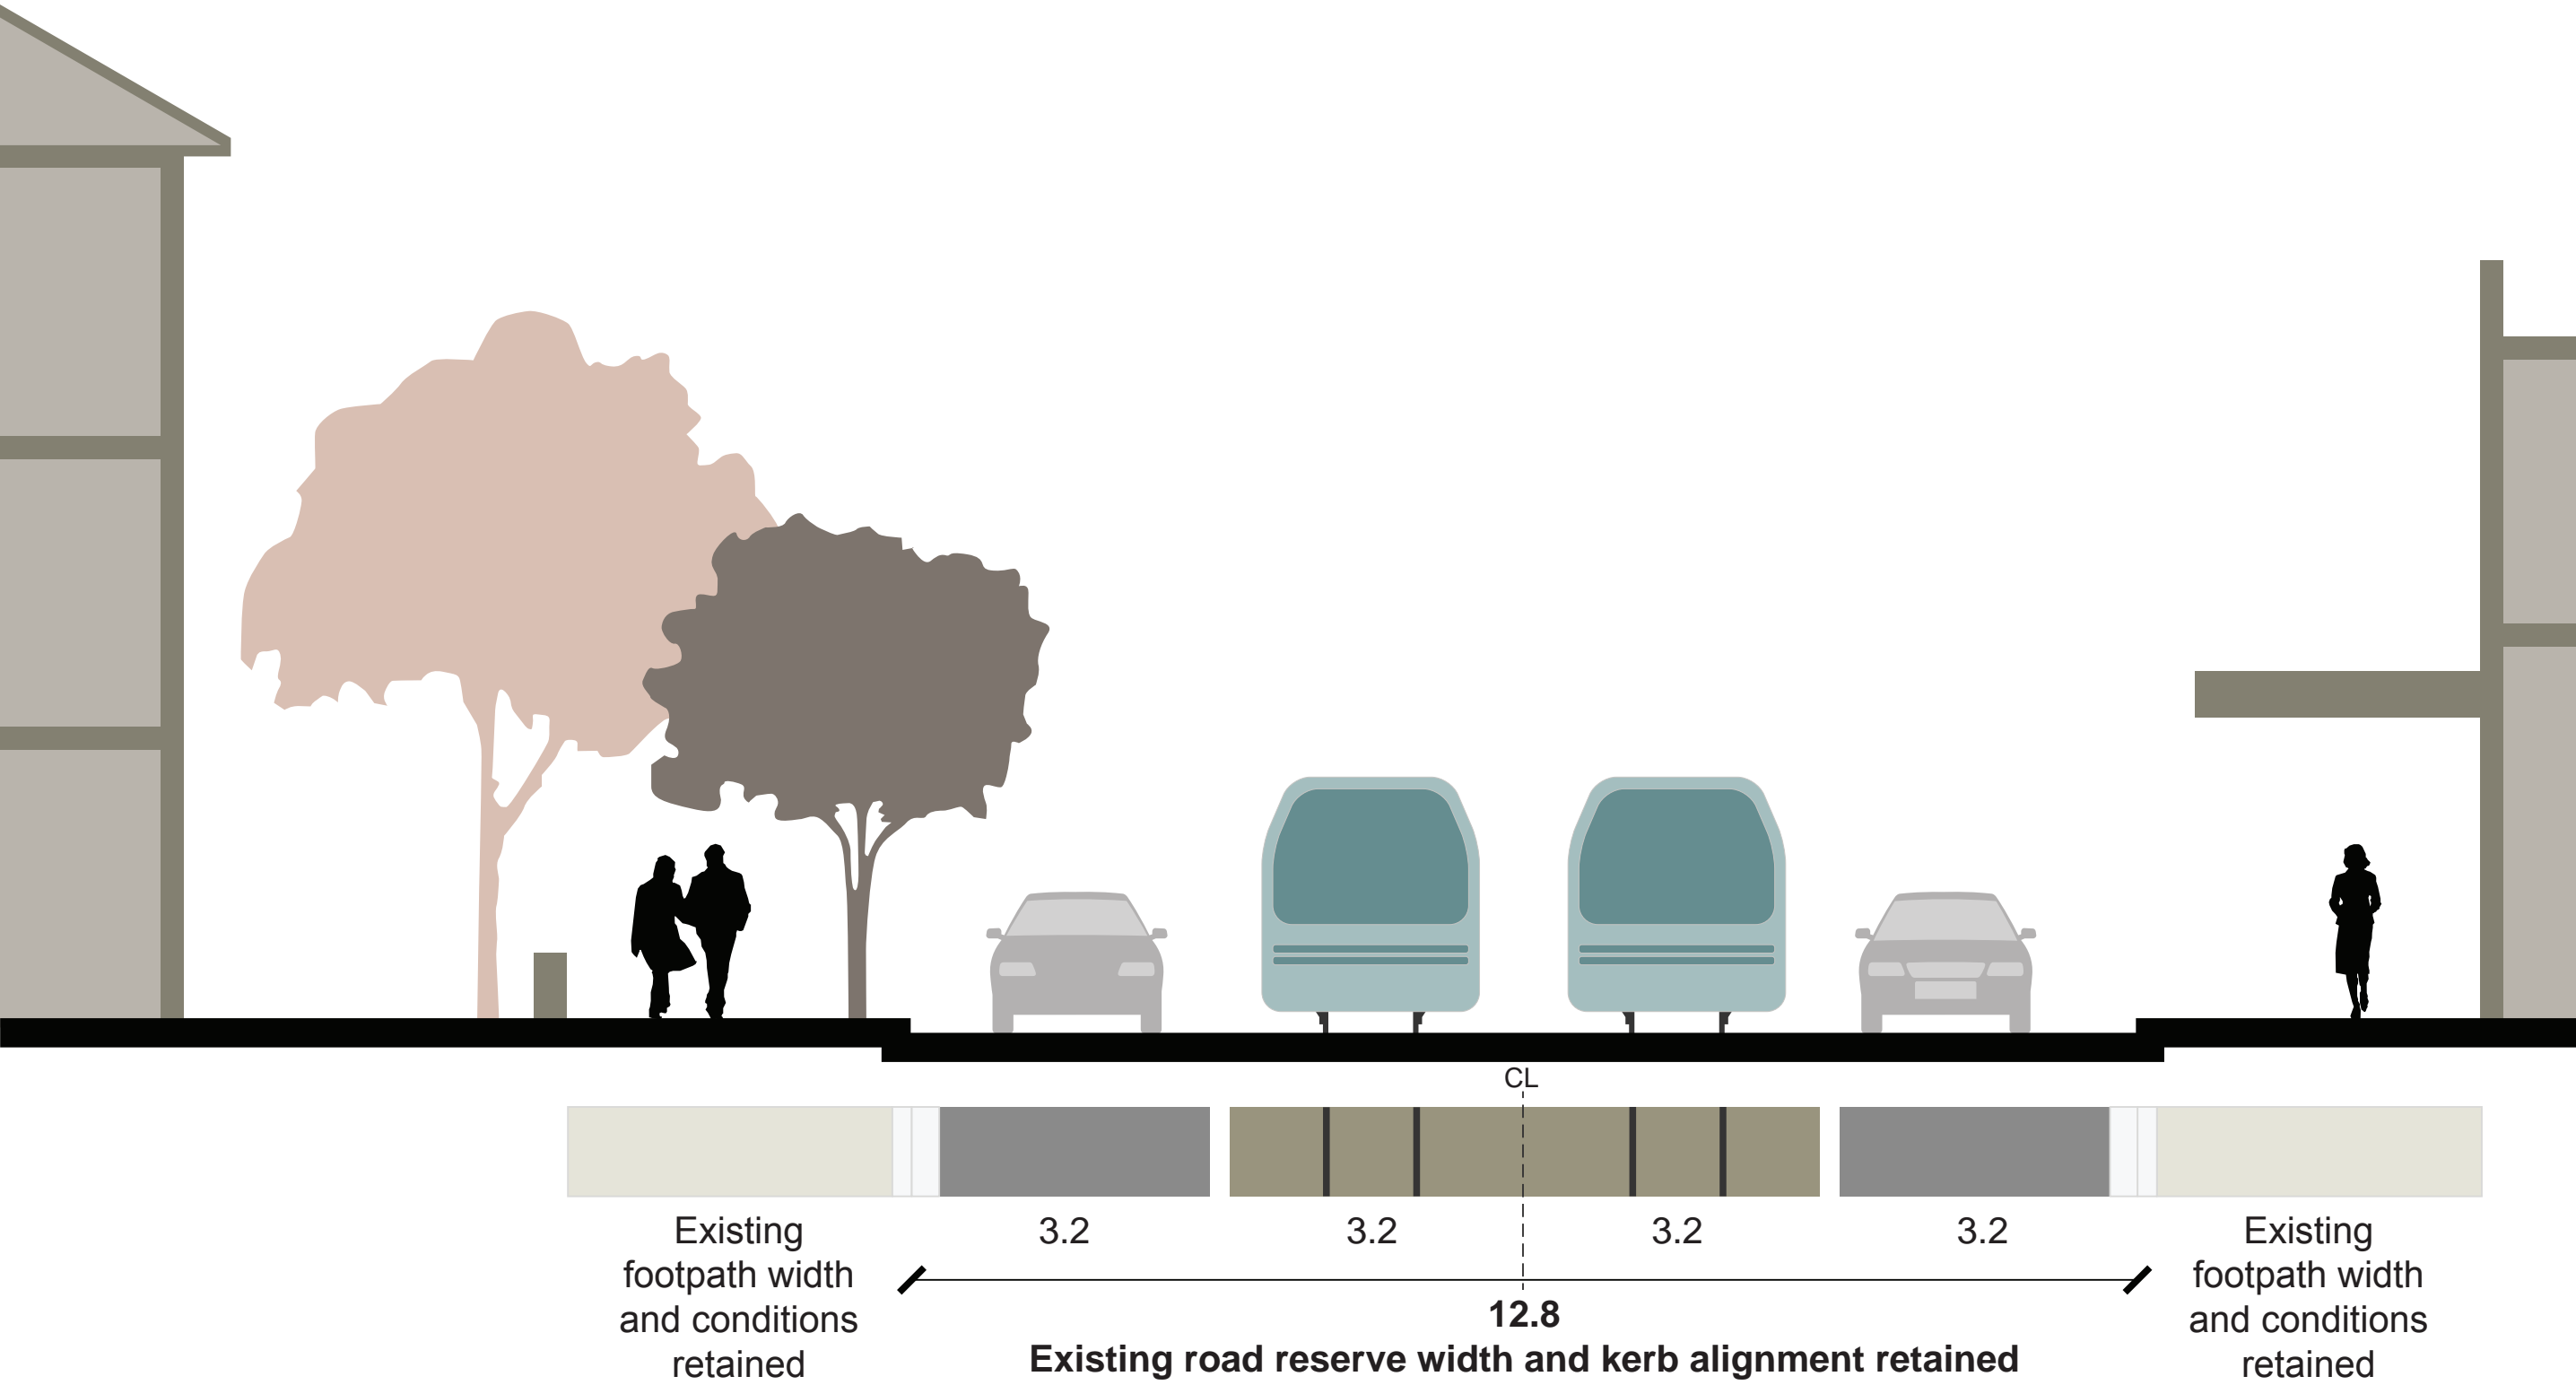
Bondi Road Typical Carriageway: Indicative Cross Section A
